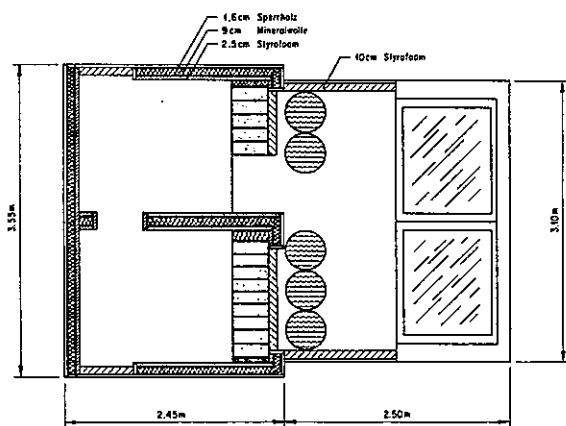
U.S. Los Alamos National Laboratory attached sunspace test cell floor plan.
